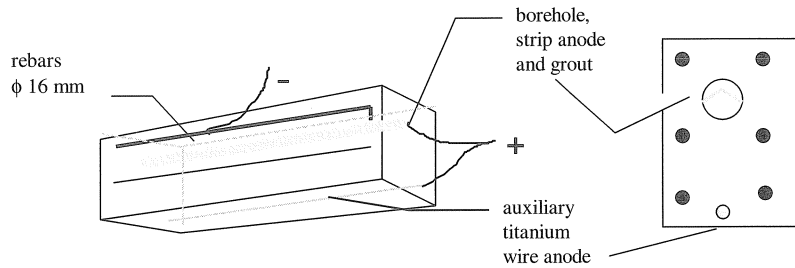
Cantilever beam with strip anode in cement-filled borehole, Tilburg.
